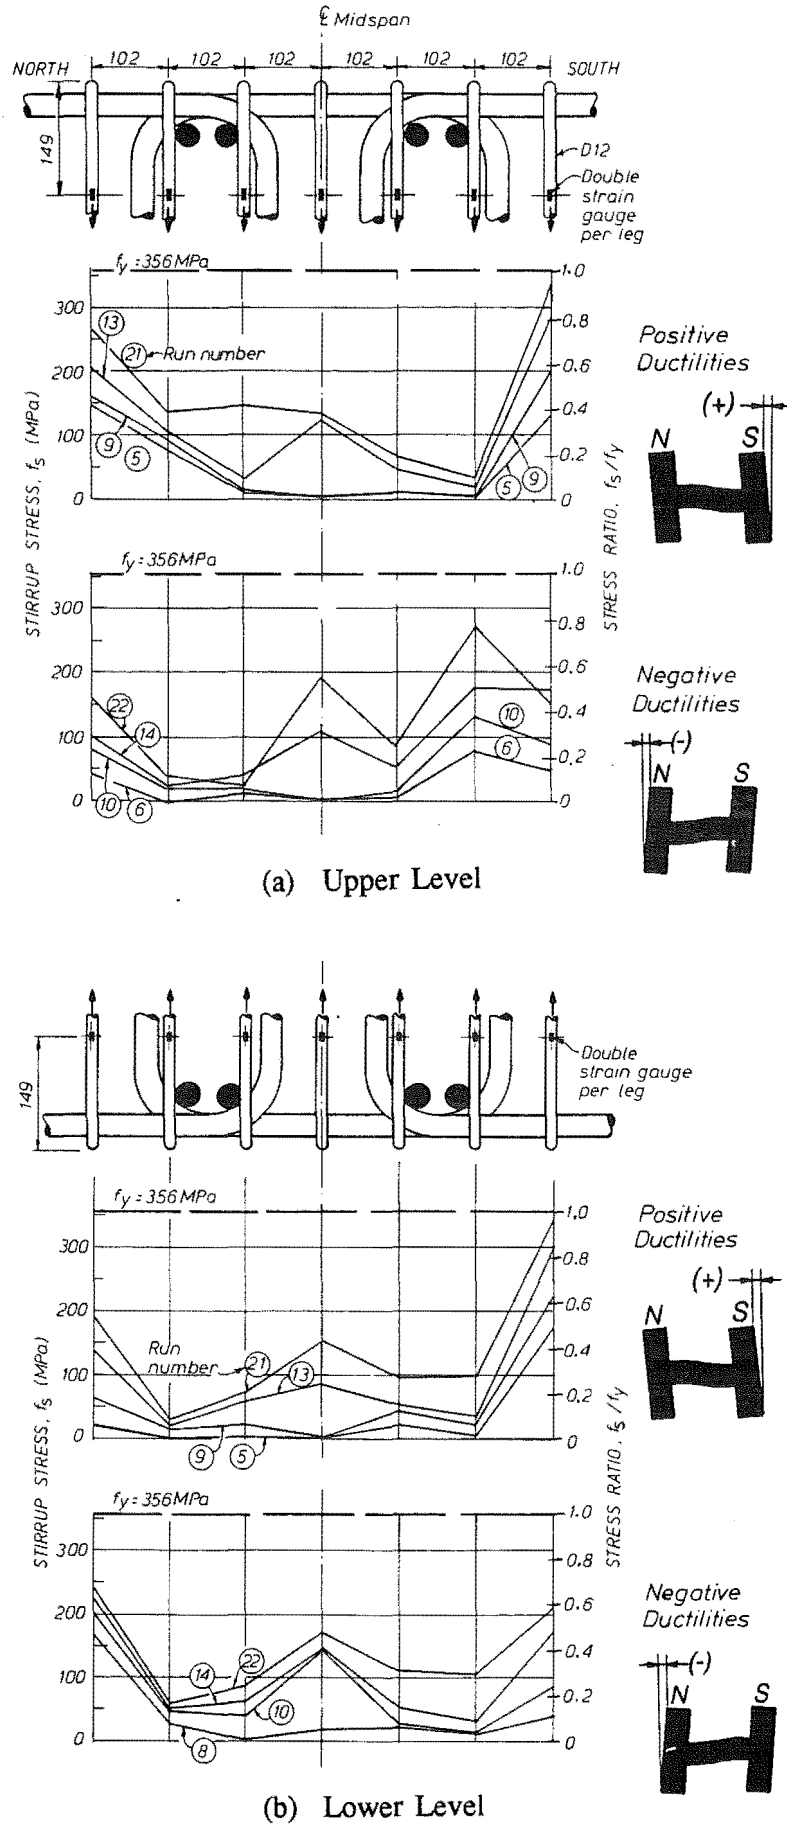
Stresses in the Vertical Transverse Reinforcement at Midspan of Unit 2.
